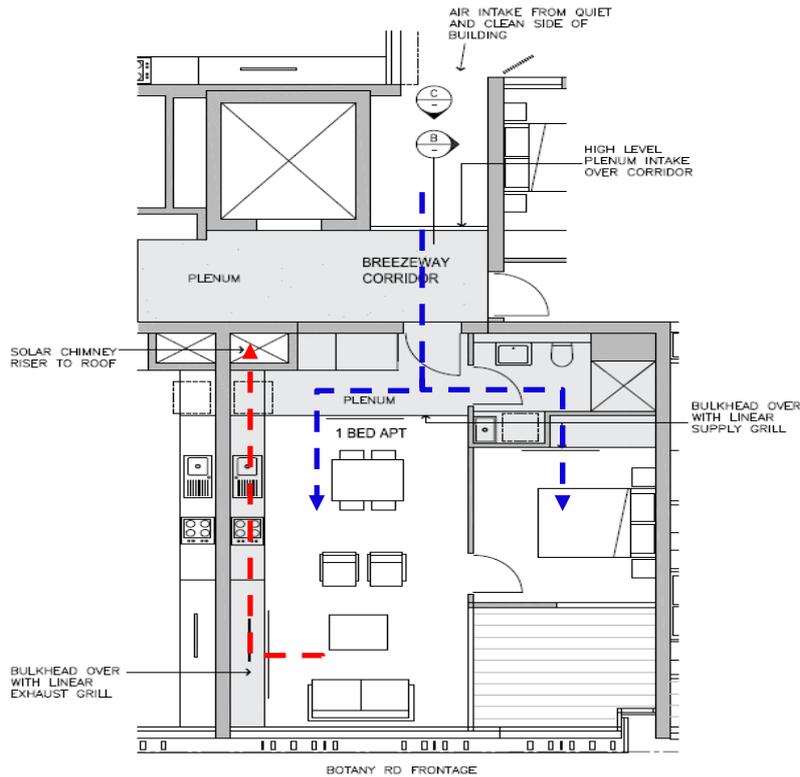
diagrammatic floor for a typical apartment facing Botany Road. The plan shows the direction of clean air being carried from internal courtyards, through plenums and into apartments (blue arrows). Air is then extracted through solar chimneys to the roof (red arrow)
